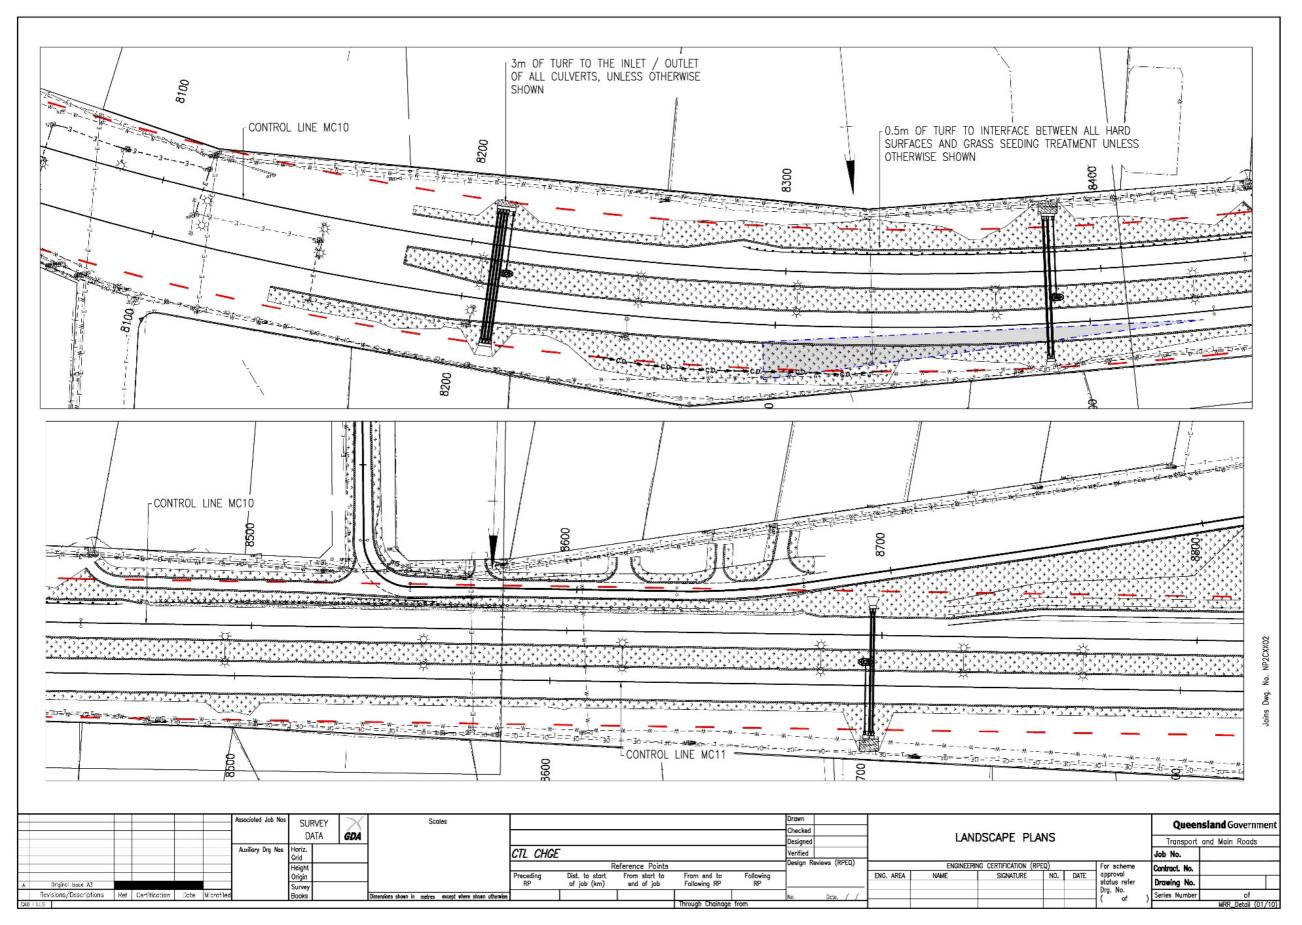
(e) - Landscaping details and layouts - generic example 2 - sheet 4 of 4
